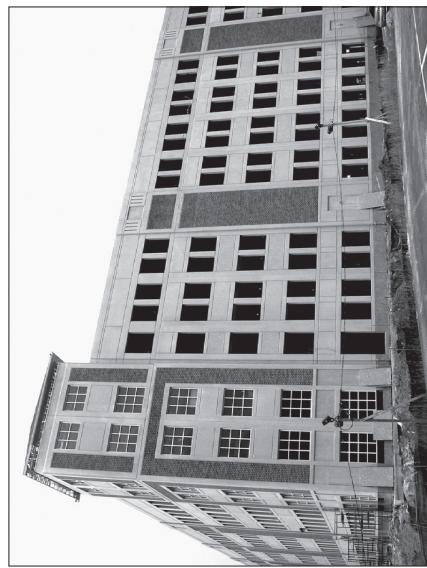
This parking garage looks more like one of the new classroom buildings on the university campus, creating an attractive addition rather than the eyesore most garages are.
